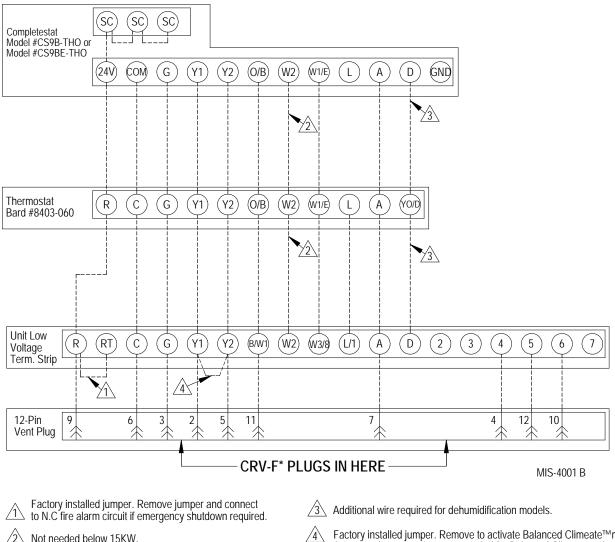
Programmable Thermostat Connections for CRV-F\* with Air Conditioners
